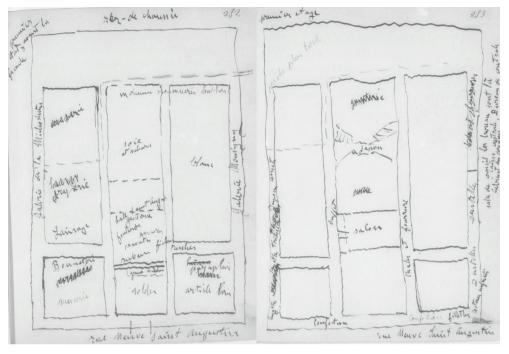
Zola's sketch of The Ladies' Paradise Floorplans (Zola, 1881)
